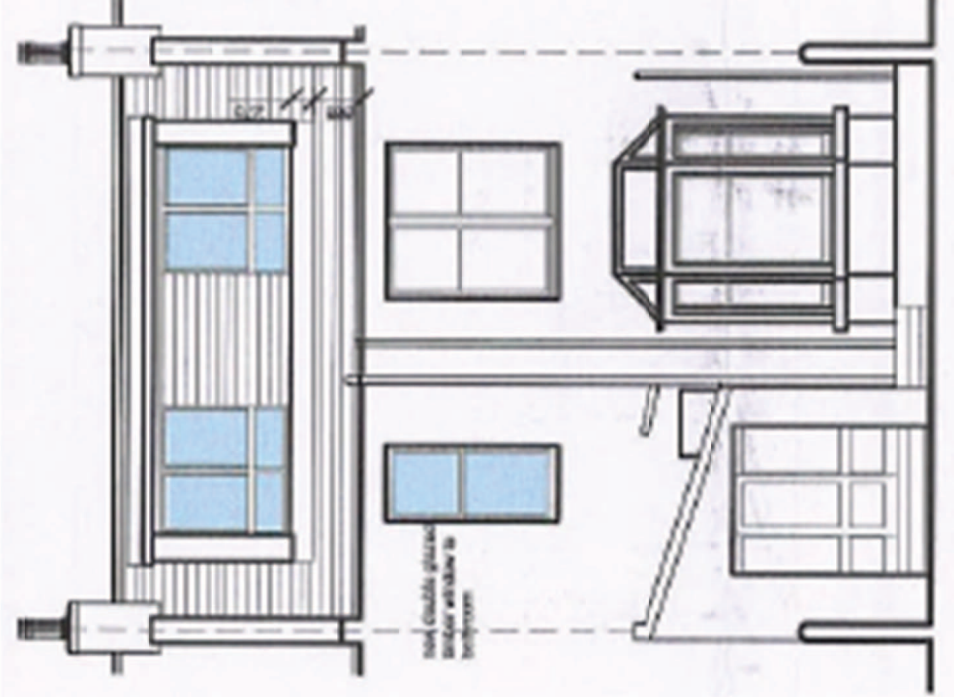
Approved Dormer to 30 Fountainhall Road Ref: 140794 (nts) Proposed Dormer to 37 Carlton Place (nts)
